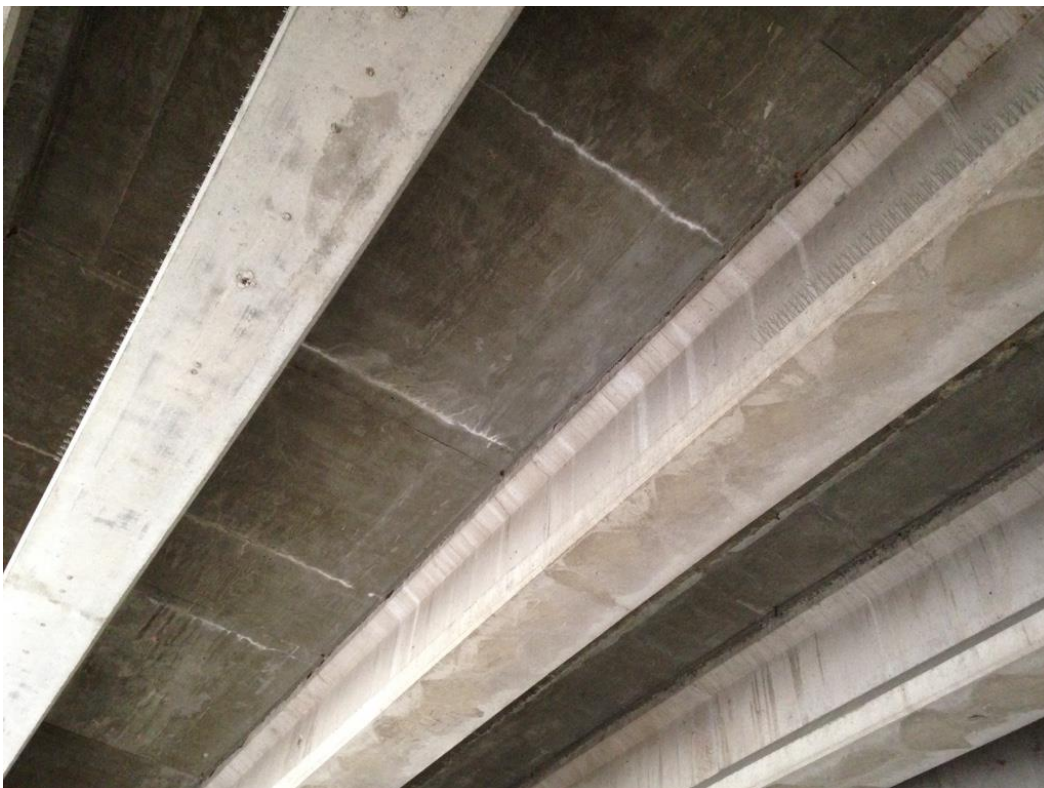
Span 3, bay 5 showing transverse hairline cracks with efflorescence.
